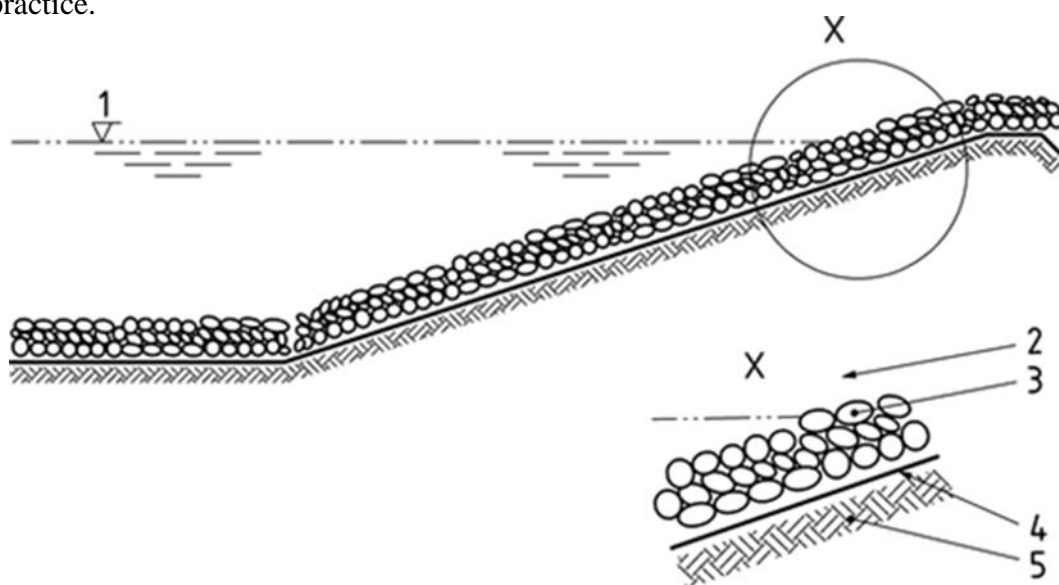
Typical cross section of geosynthetic barrier system as a canal lining system (1 top water level, 2 upstream face, 3 revetment, 4 geosynthetic barrier, 5 dam body)
